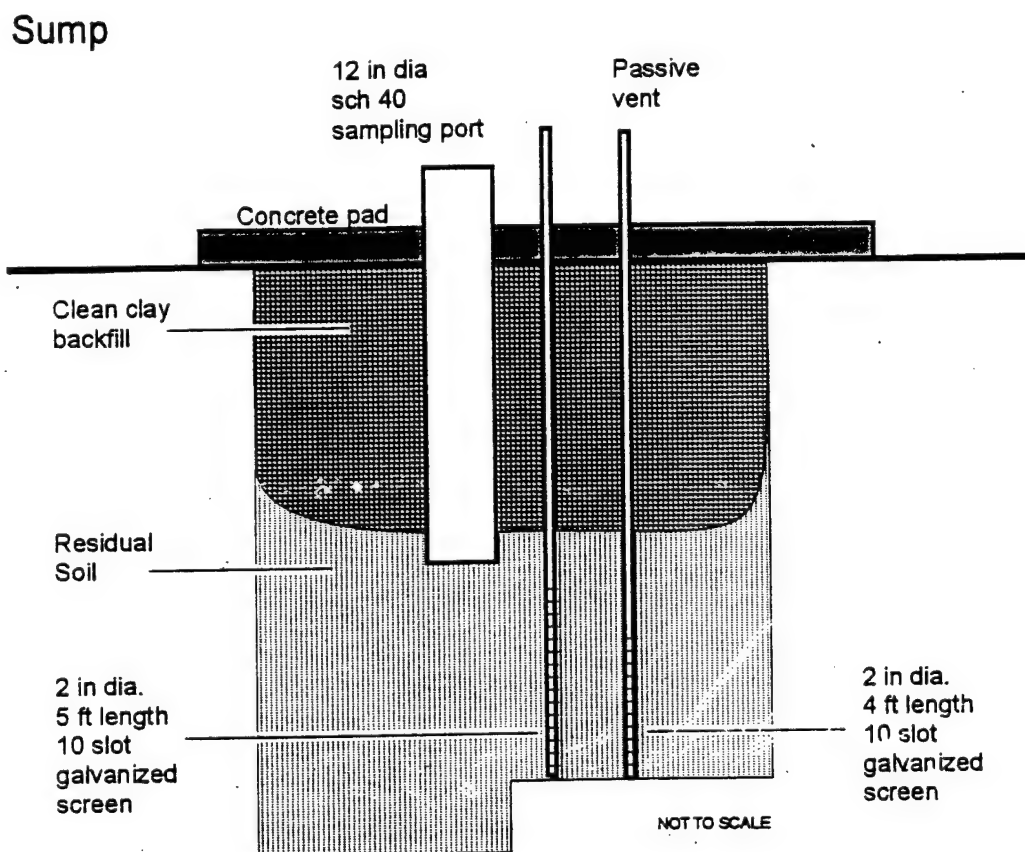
Cross Section of Tank 3144 Showing Construction Details of Installations
